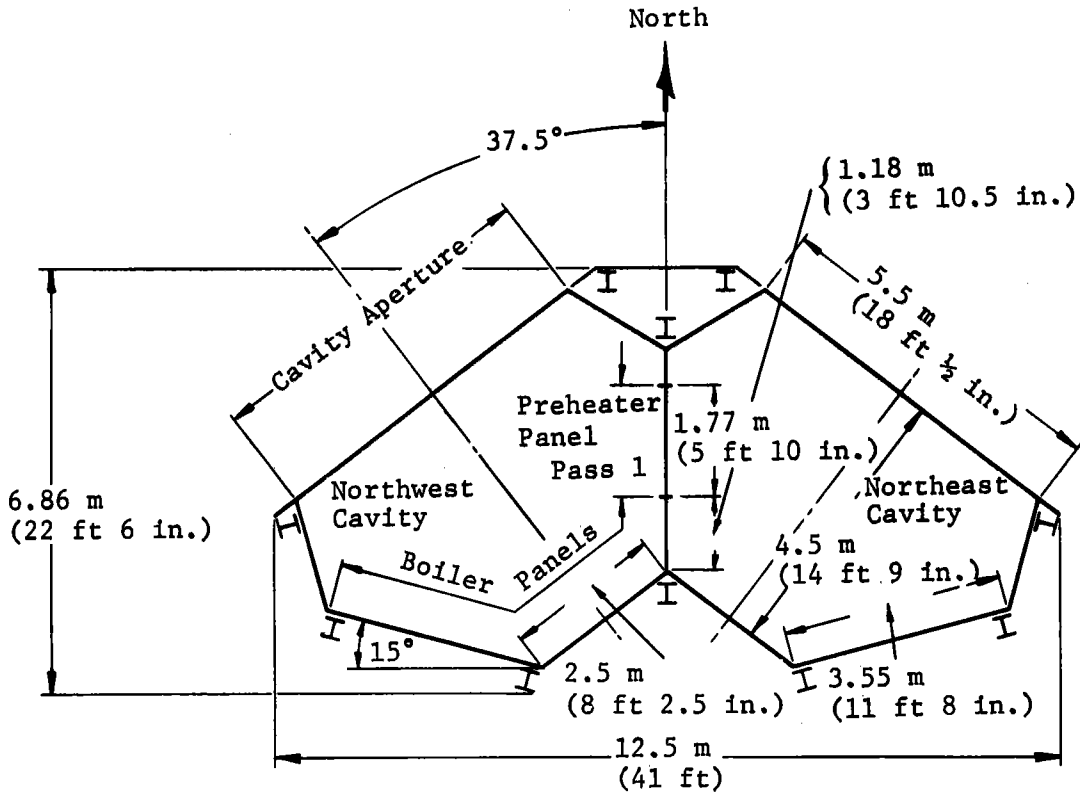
Twin-Cavity Arrangement Plan View
